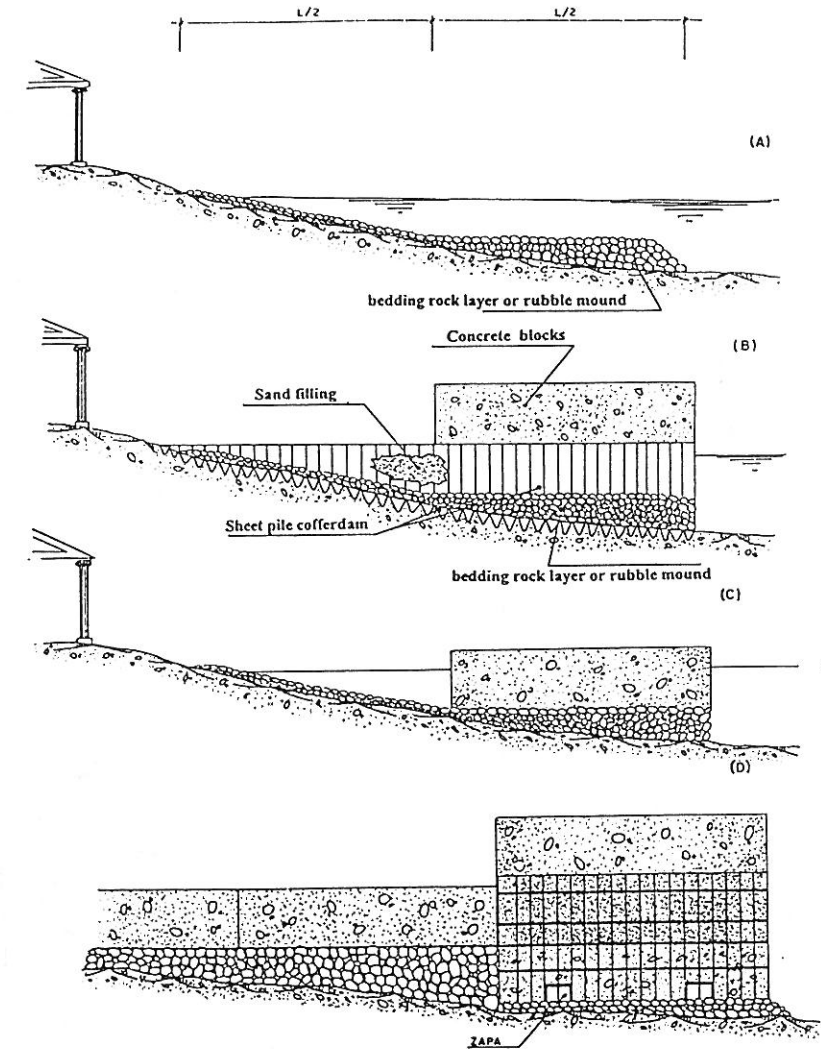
Construction steps for concrete blocks vertical breakwater (de la Peña, Prada & Redondo '95, according to Vitruvius (5-13))
